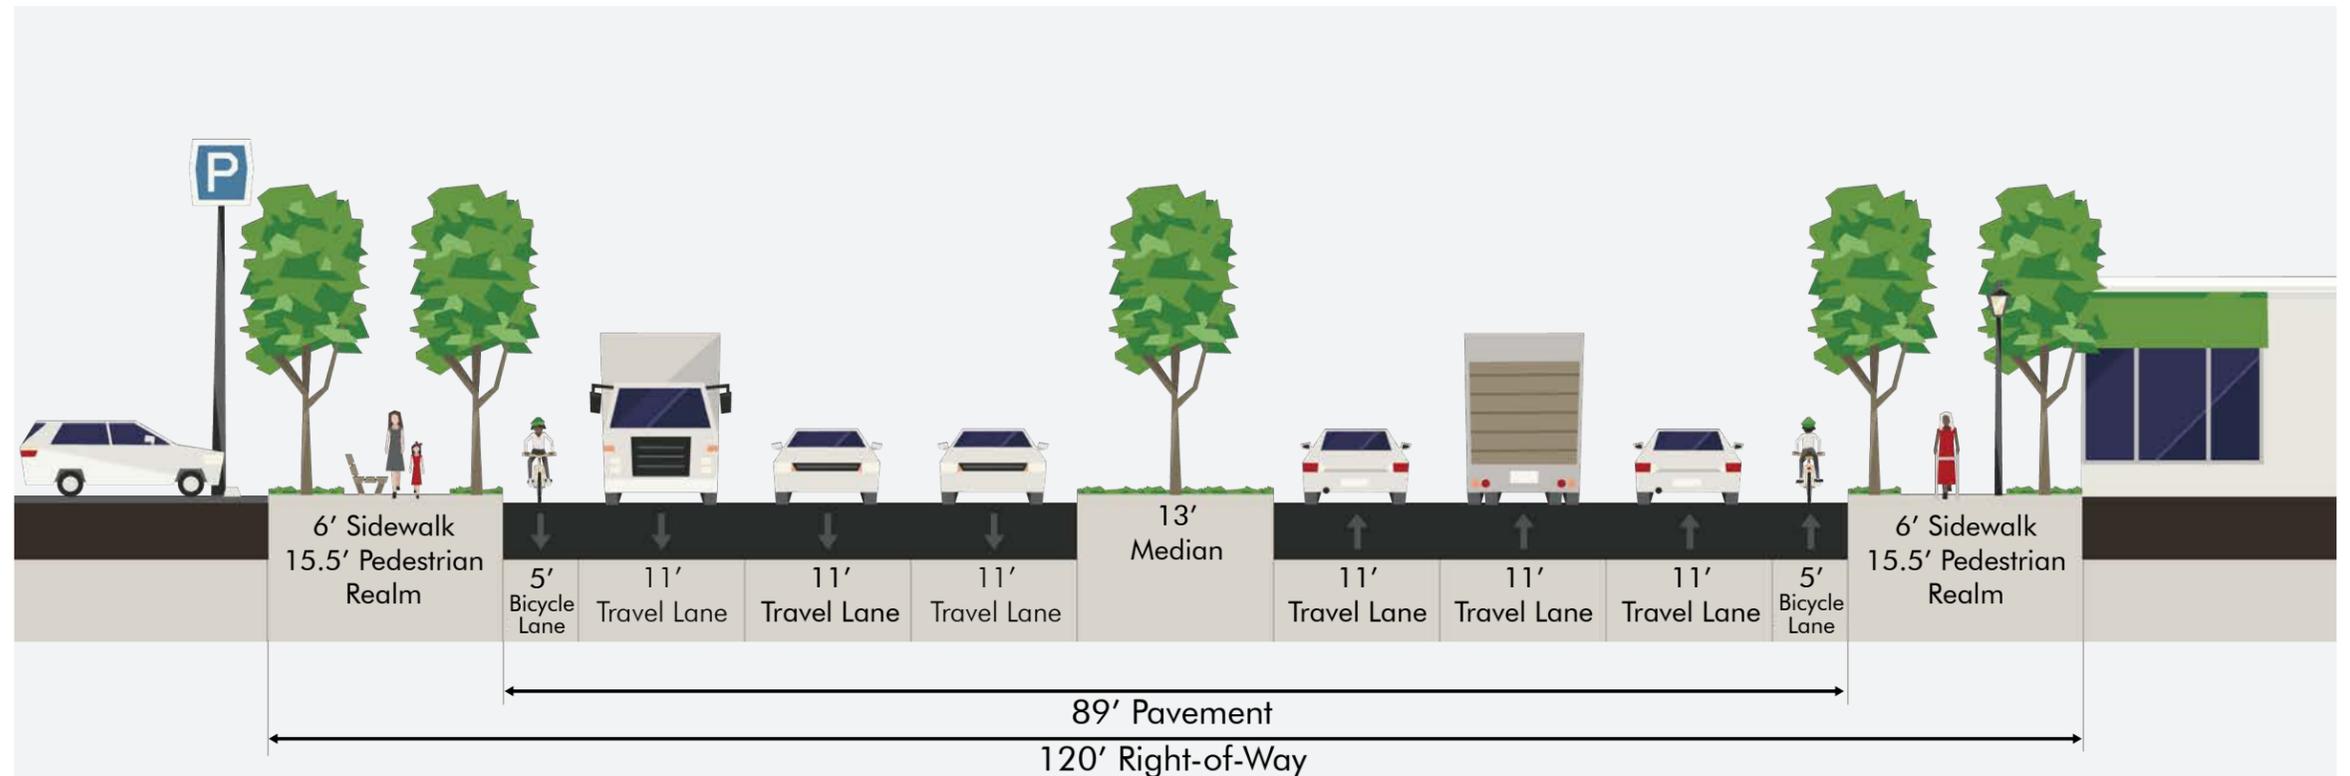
Proposed Typical Cross-section - Roark Road to Dove Country Drive
